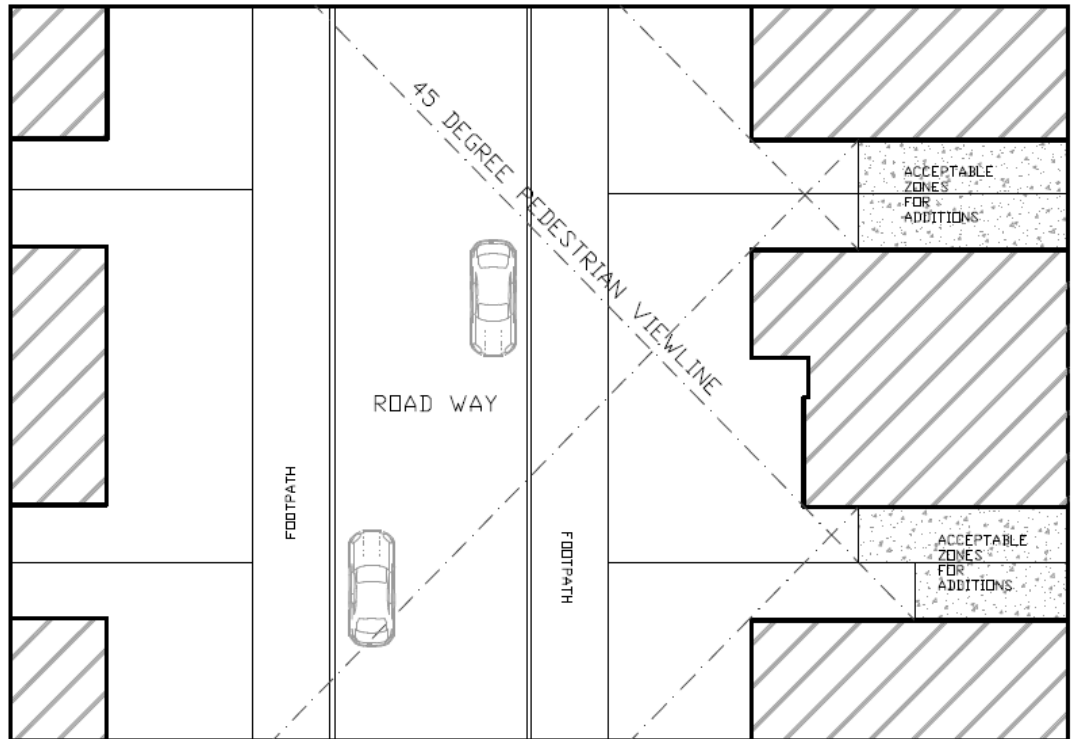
acceptable areas for ground level additions are sited within the area created by drawing a 45 degree view line from the opposite footpath through the front corner of the subject building and the corners of adjacent buildings.
